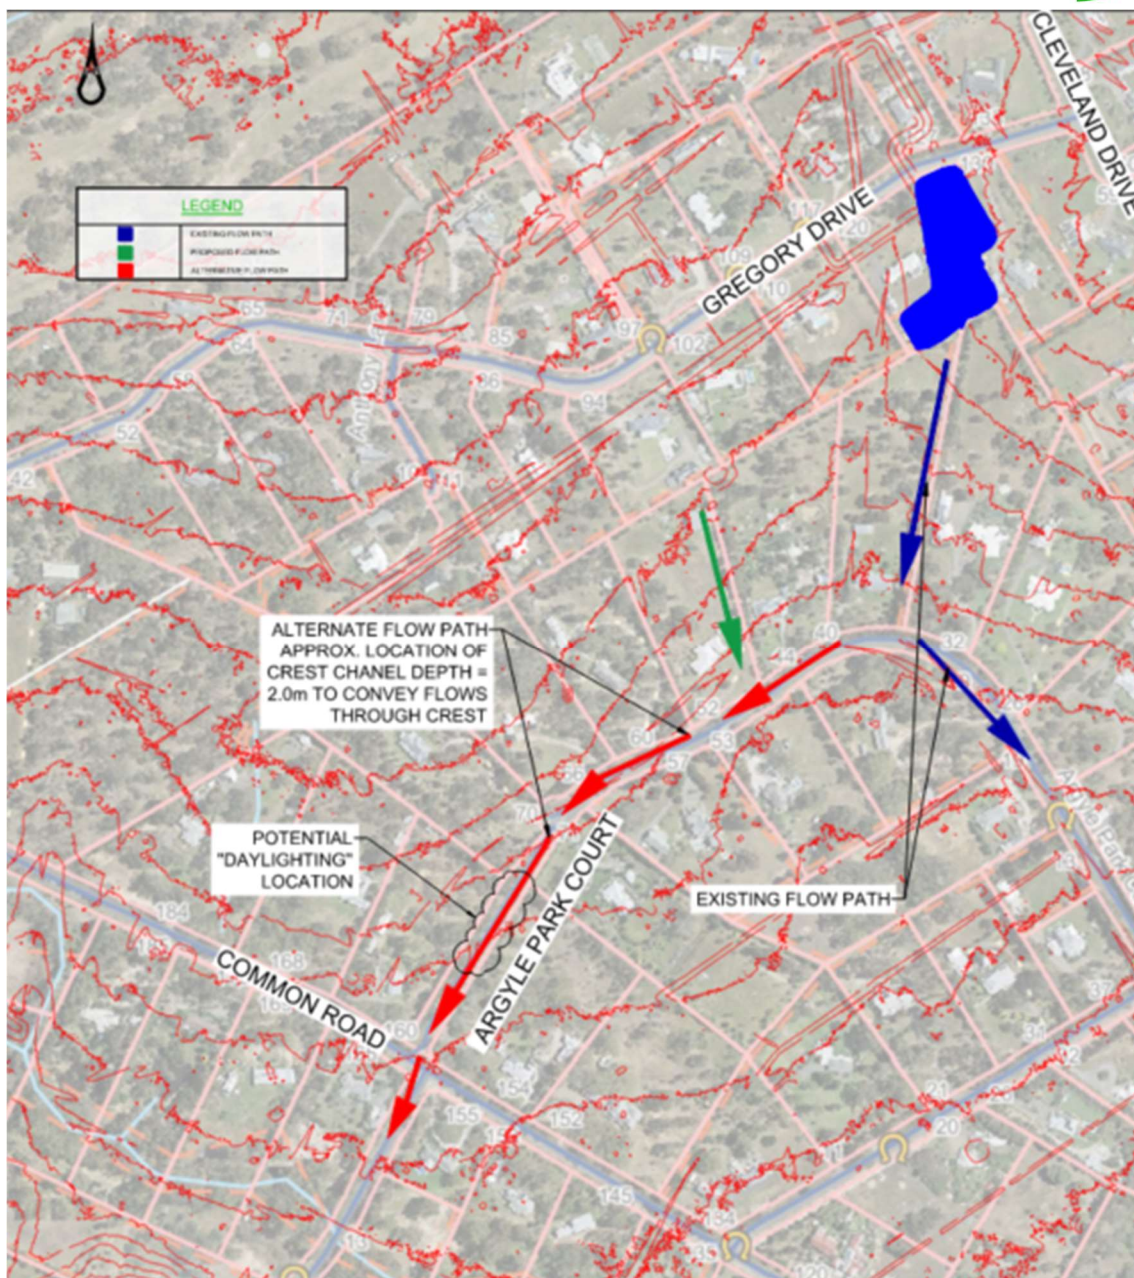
Alignment of Option 2b Proposed Western Outfall (Big Basin + outfall via Argyle Park Court)
